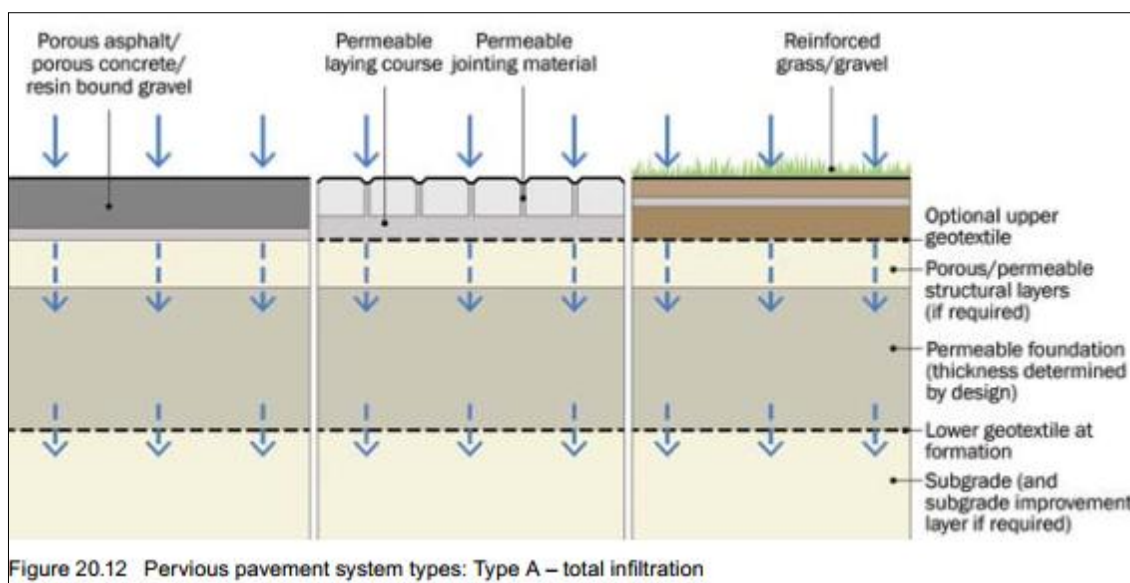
Typical Cross Section of infiltration permeable paving (Extract from CIRA SuDs Manual)
